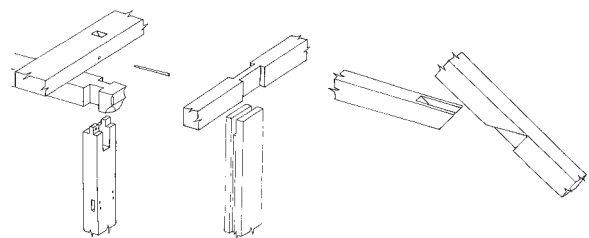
Post with *Einhälsung* (necked joint) of an anchor beam in the head of a post – *Einhälsung* (bridled joint) of a wall plate in Sweden – *Einhälsung* (bridled joint) between rafter and collar.
